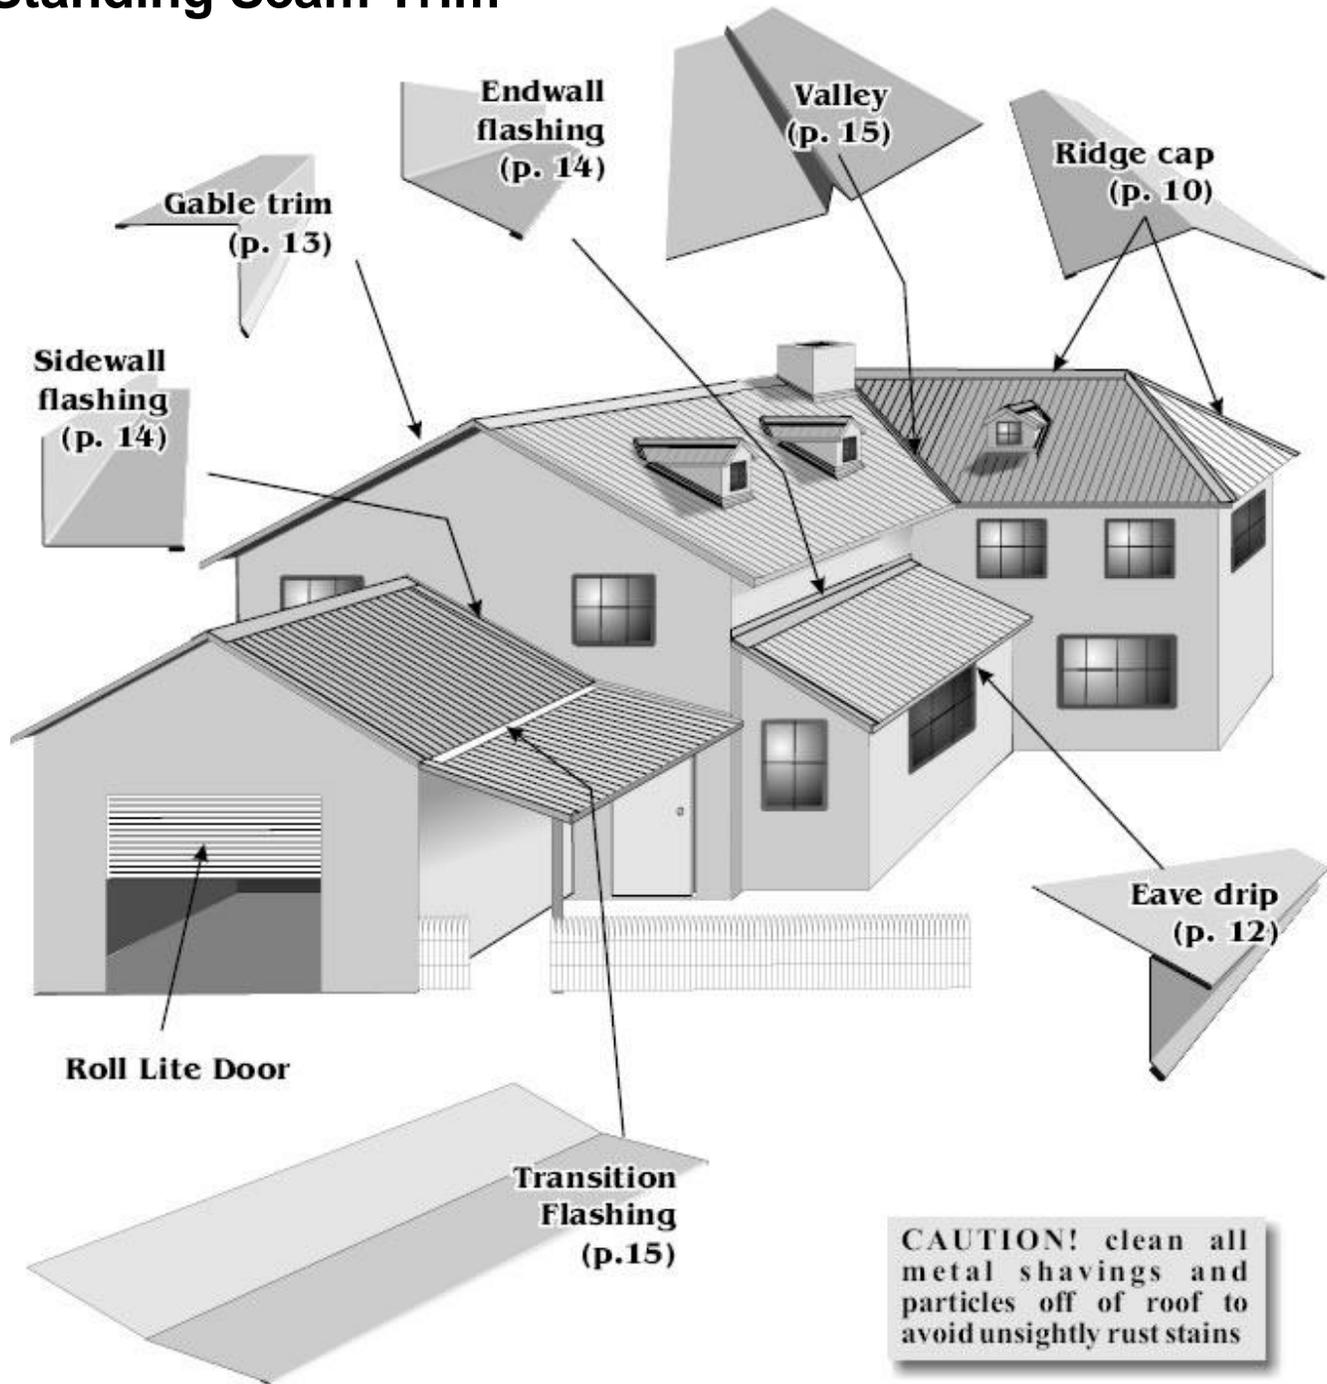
Roofing trim and flashings are named by the location or function of that particular piece on the building
